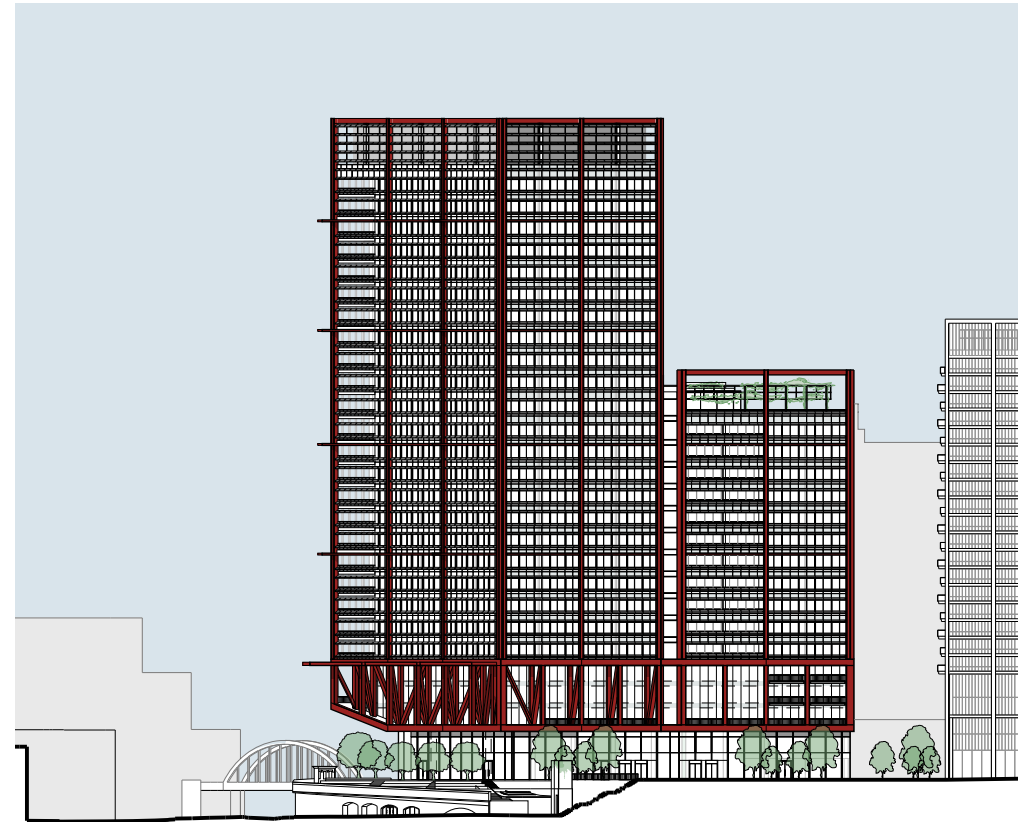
Commercial Street – Revised Elevation with structural framing to projecting Fins
